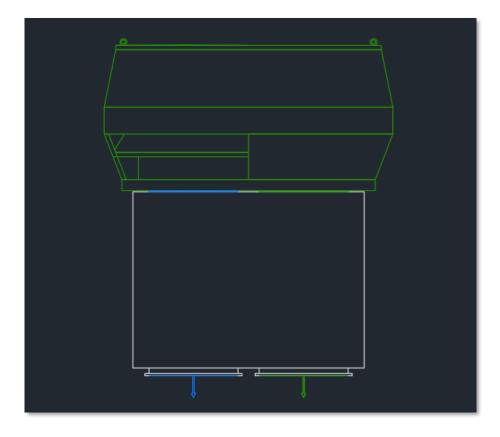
Combination roof hood and inlet products 3D geometry in AutoCAD drawing
